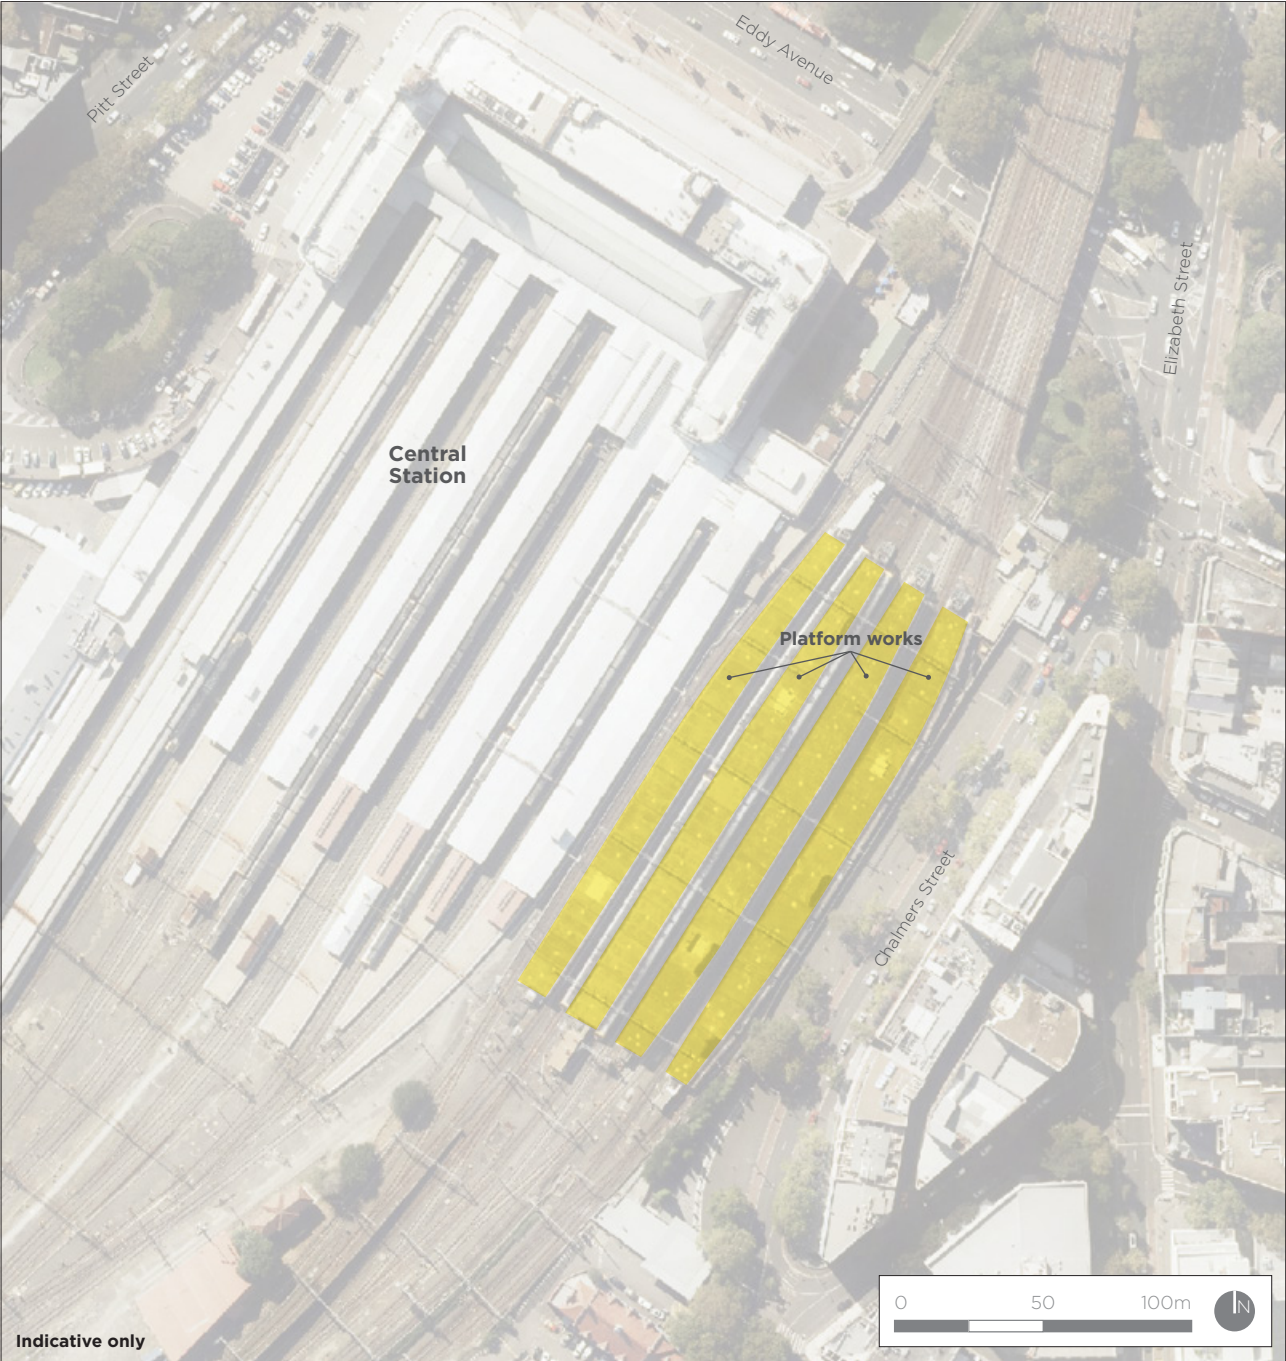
Extent of Central Walk aboveground suburban platform works
